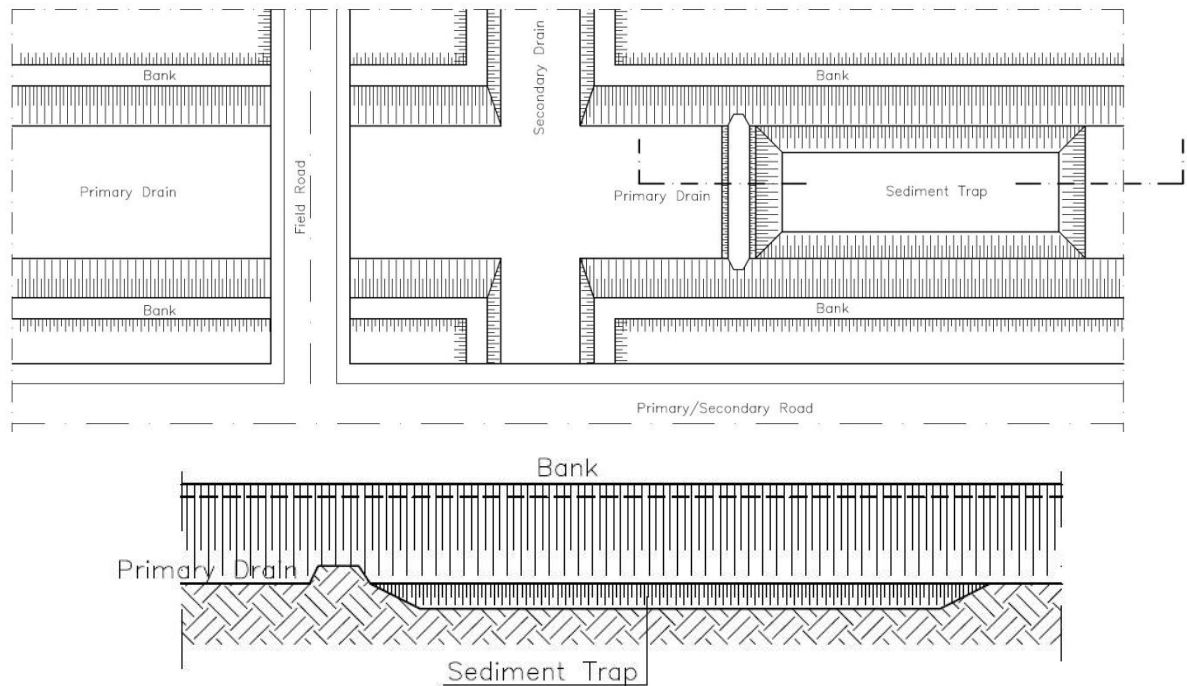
Planimetric view and longitudinal along primary drain to identify designed sediment traps
